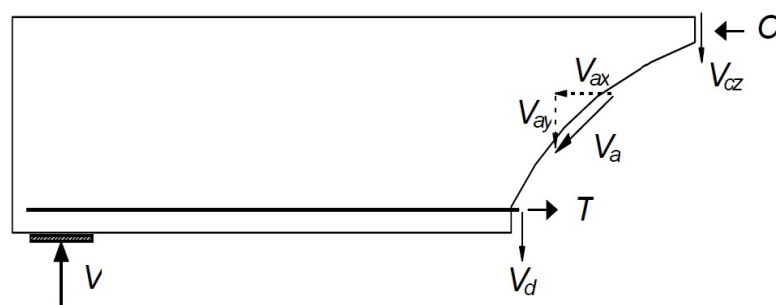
Shear failure mode in concrete beams without shear links
